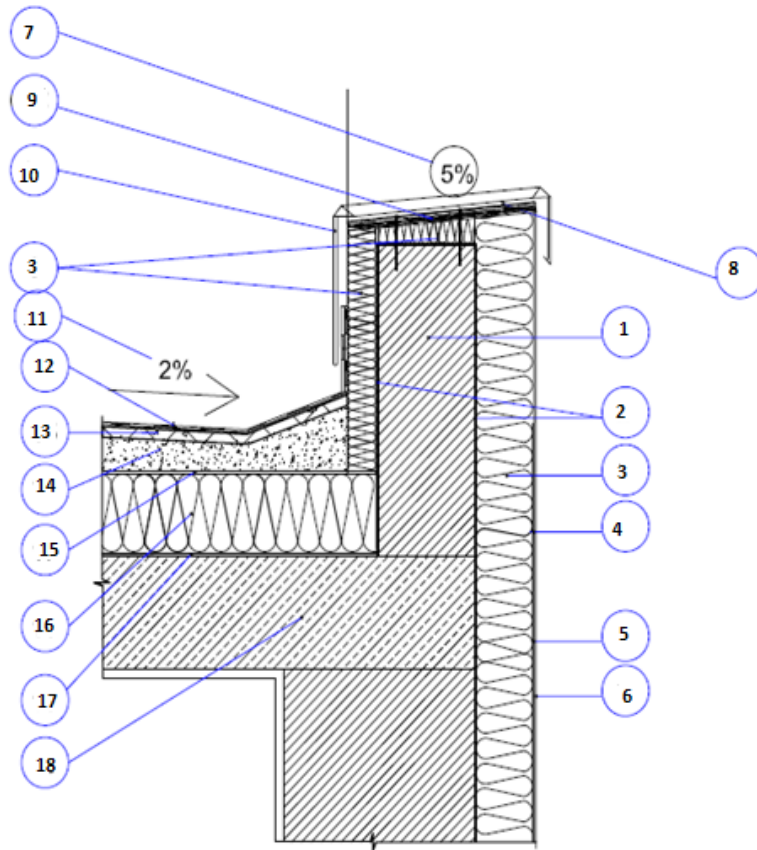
Schematic drawing of connection of the roof with parapet (with a metal sheet cover)
